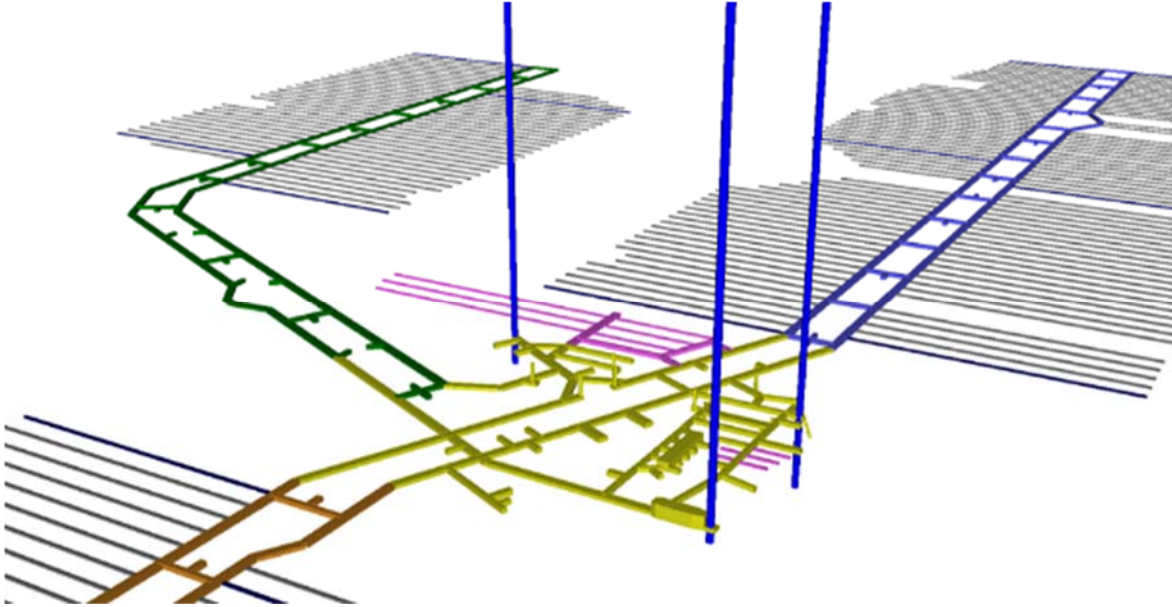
Illustration of centralized service area of repository showing the underground demonstration areas (highlighted in purple). (For illustration purposes only; does not reflect site-specific layout for South Bruce Site.)
